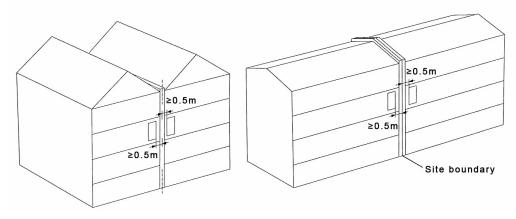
c - Distances of openings to fire compartment forming walls
